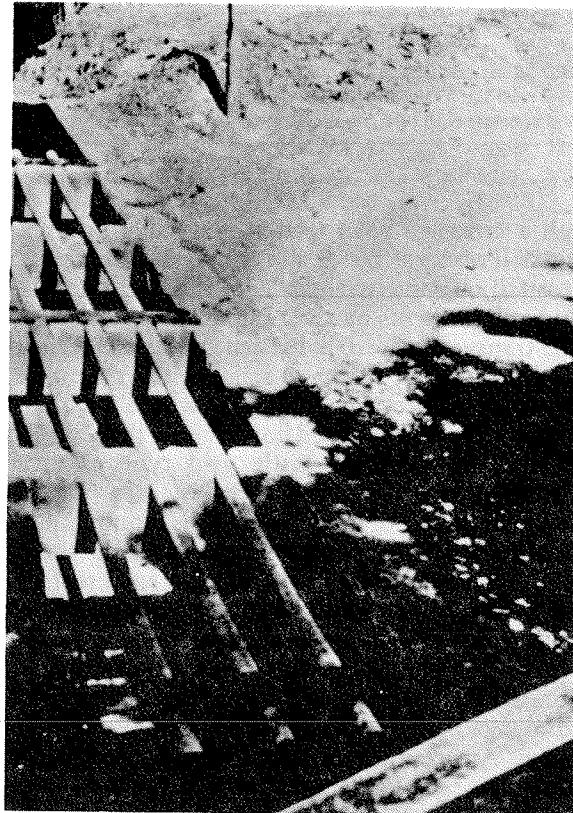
Cattle grid type drain to collect water flowing longitudinally down the road on steep slopes in Malaysia.
